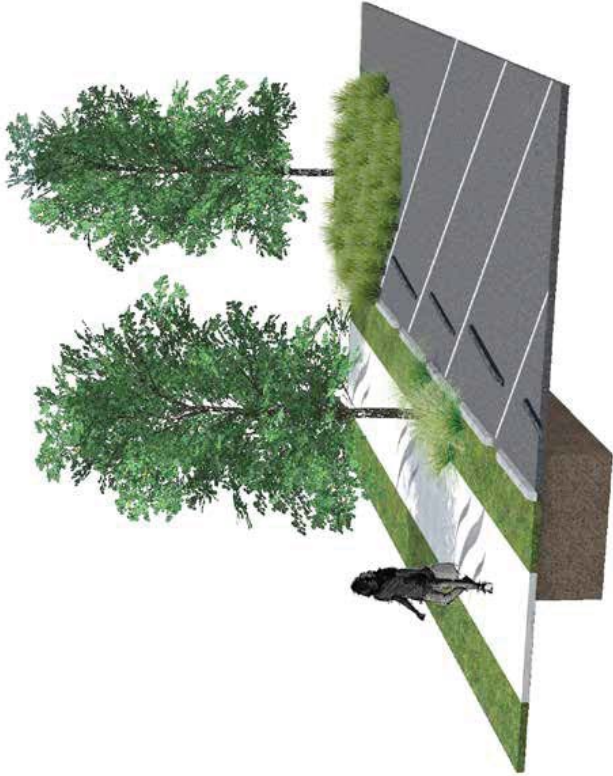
TYPICAL STREET TREE PLANTING - TOOWOON BAY ROAD
